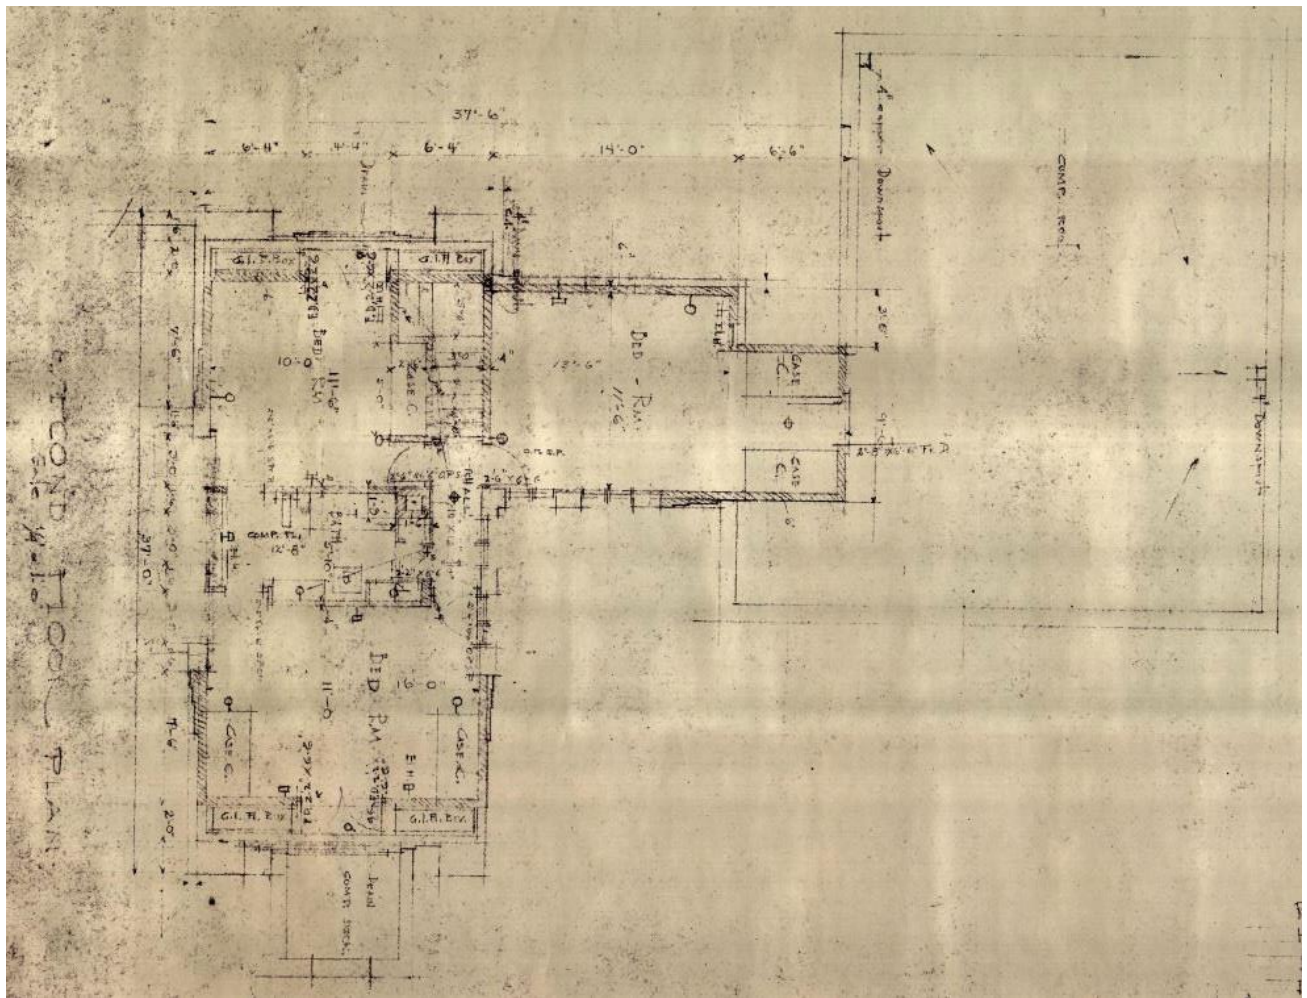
The second floor plan of the Henry Bollman House, 1922.
